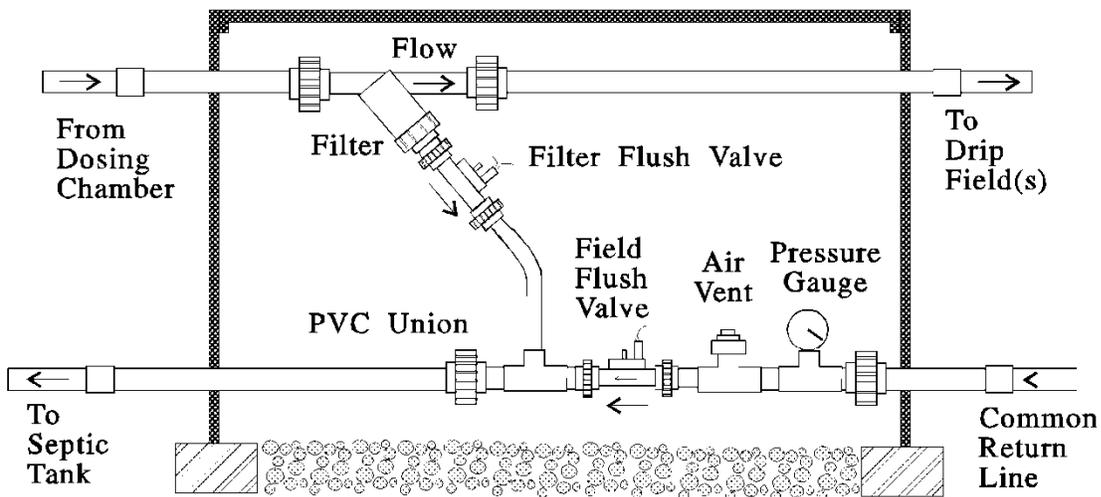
Cross-sectional view of typical filter, valve, and meter assembly.
